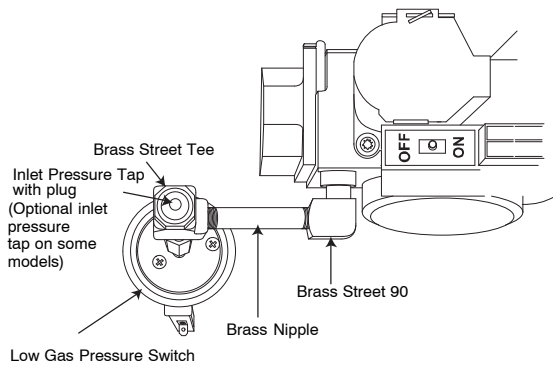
Alternate Low Gas Pressure Switch – 17 1/2-in. (445 mm) and wider furnaces
